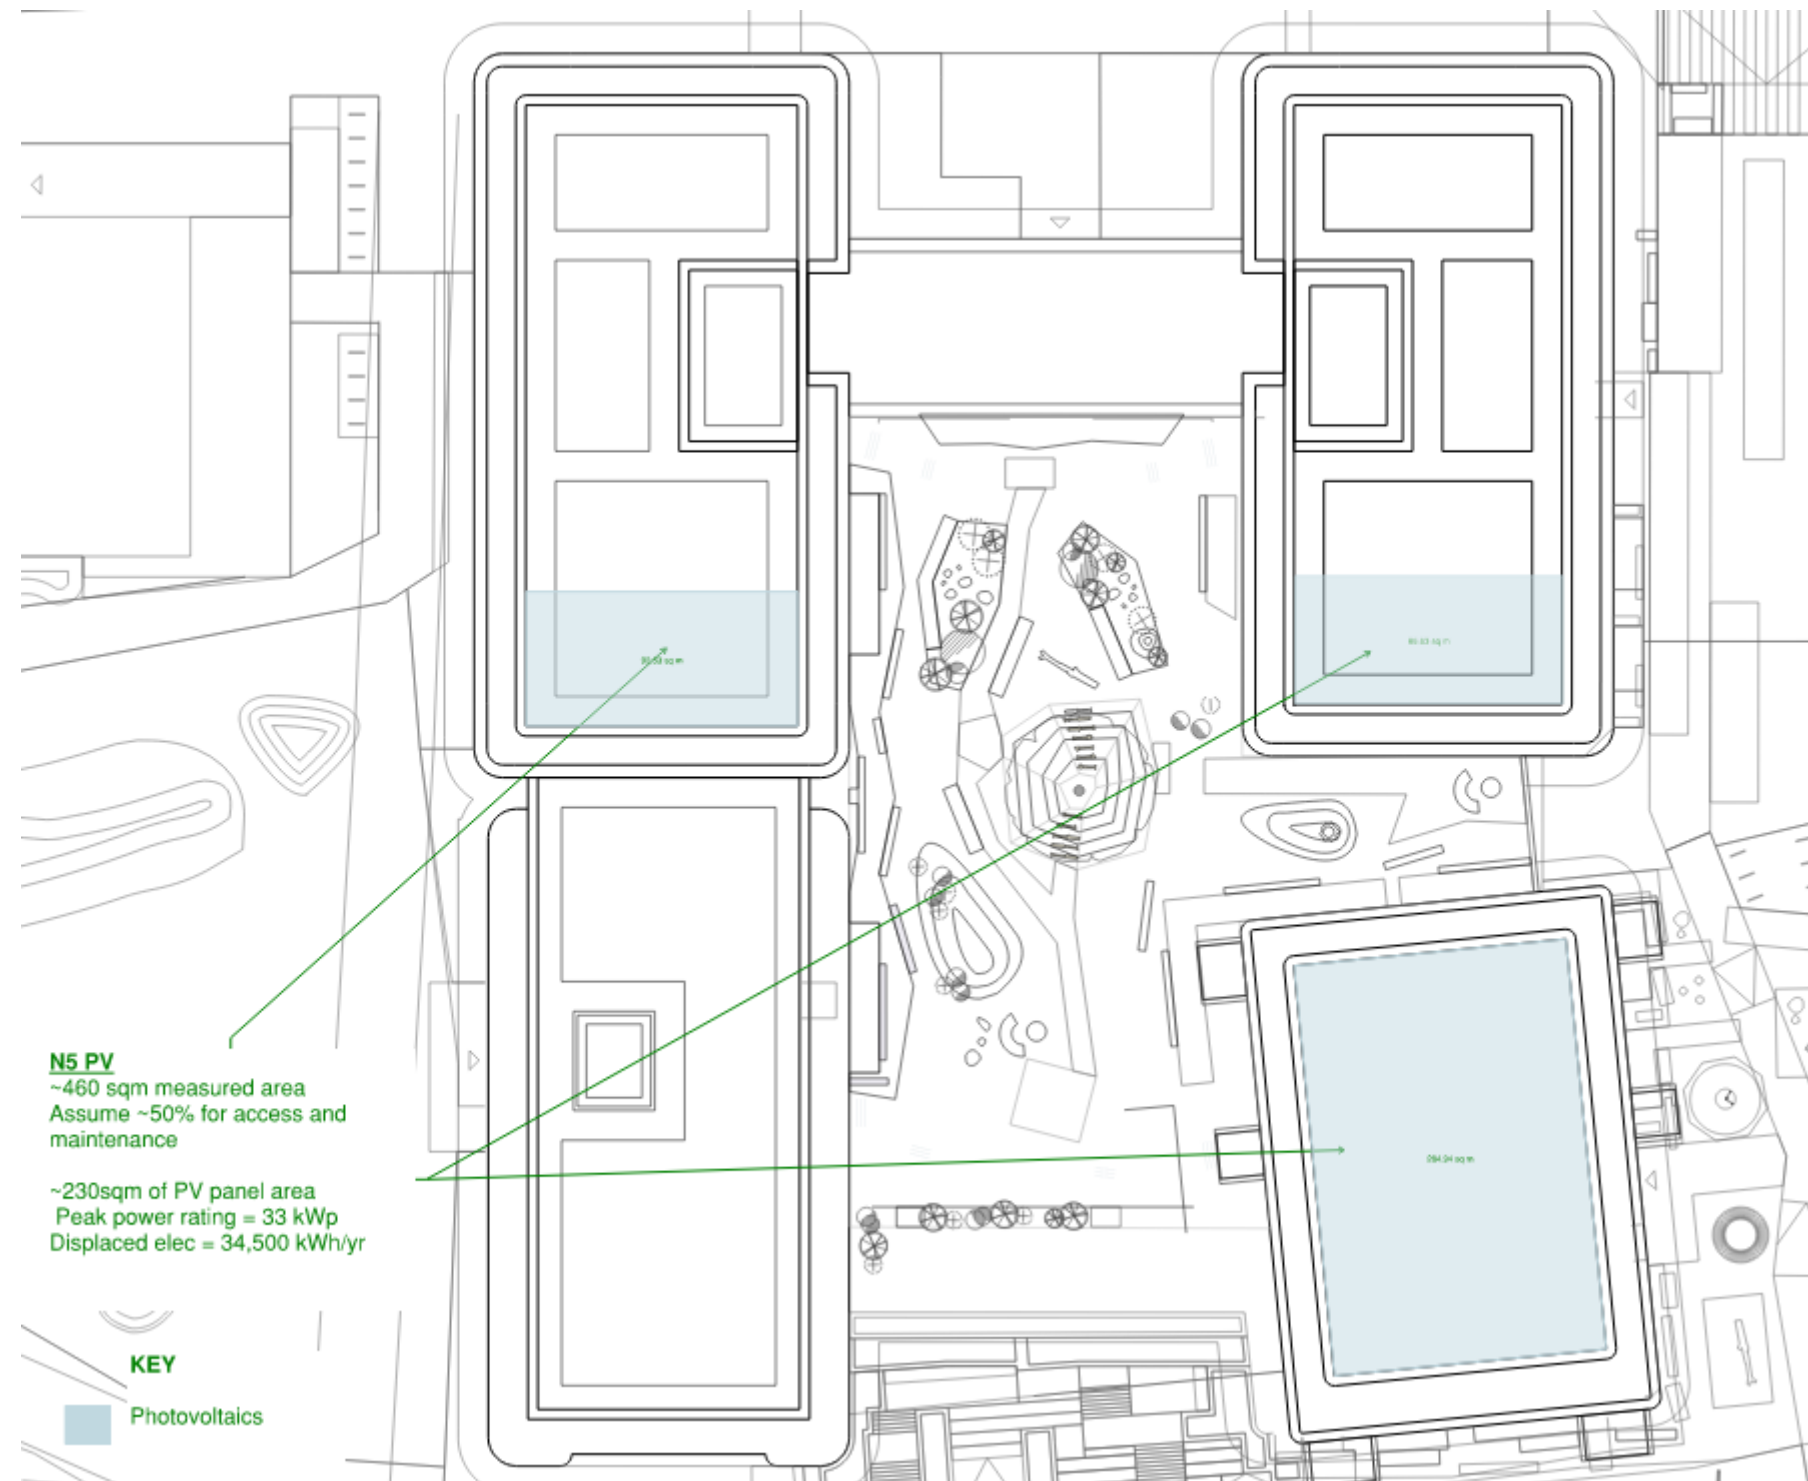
N4 - proposed area for solar photovoltaics on roof plan
